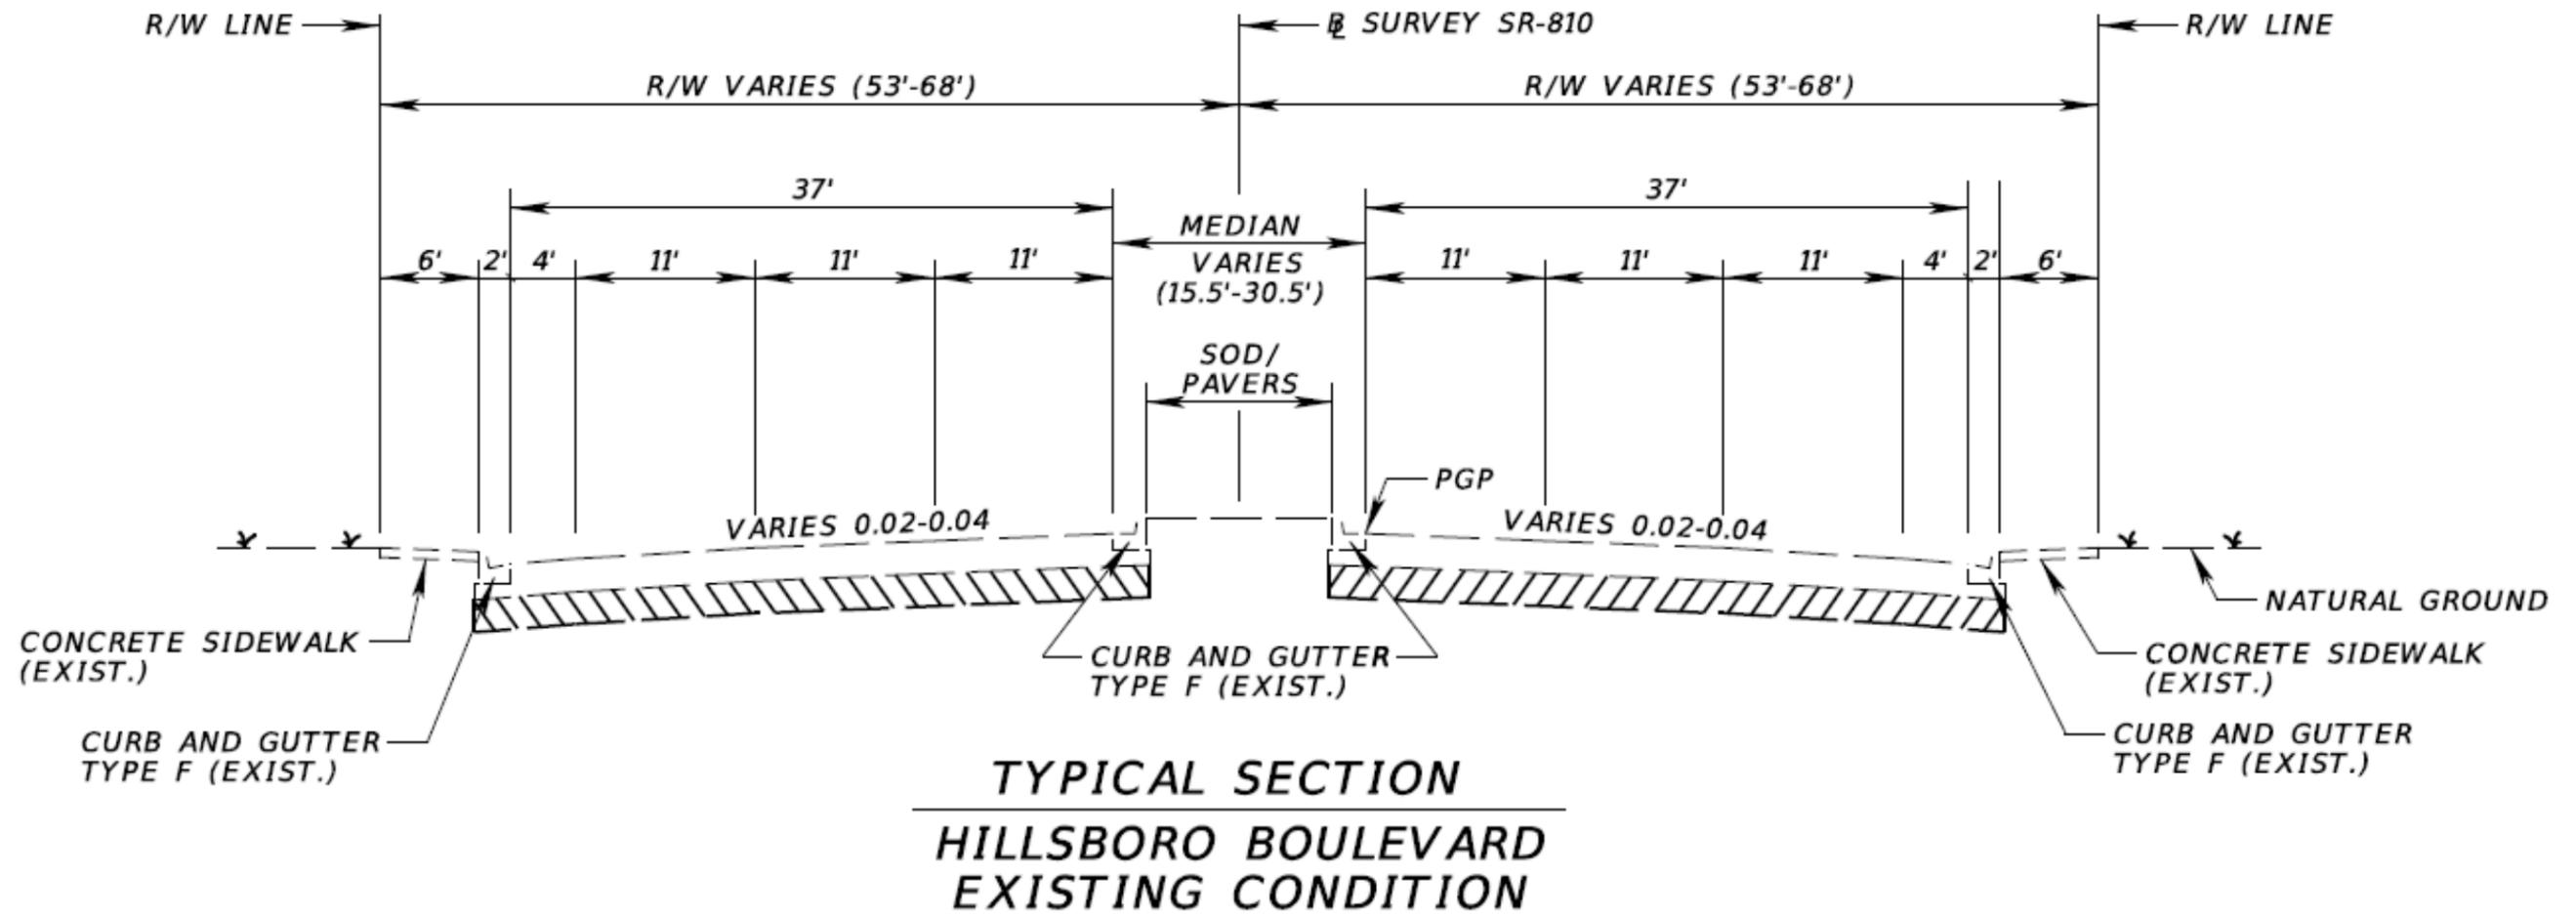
Existing Typical Section – Hillsboro Boulevard
